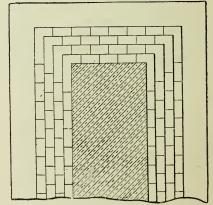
Plan of Footings and Concrete under Two-brick Wall.
